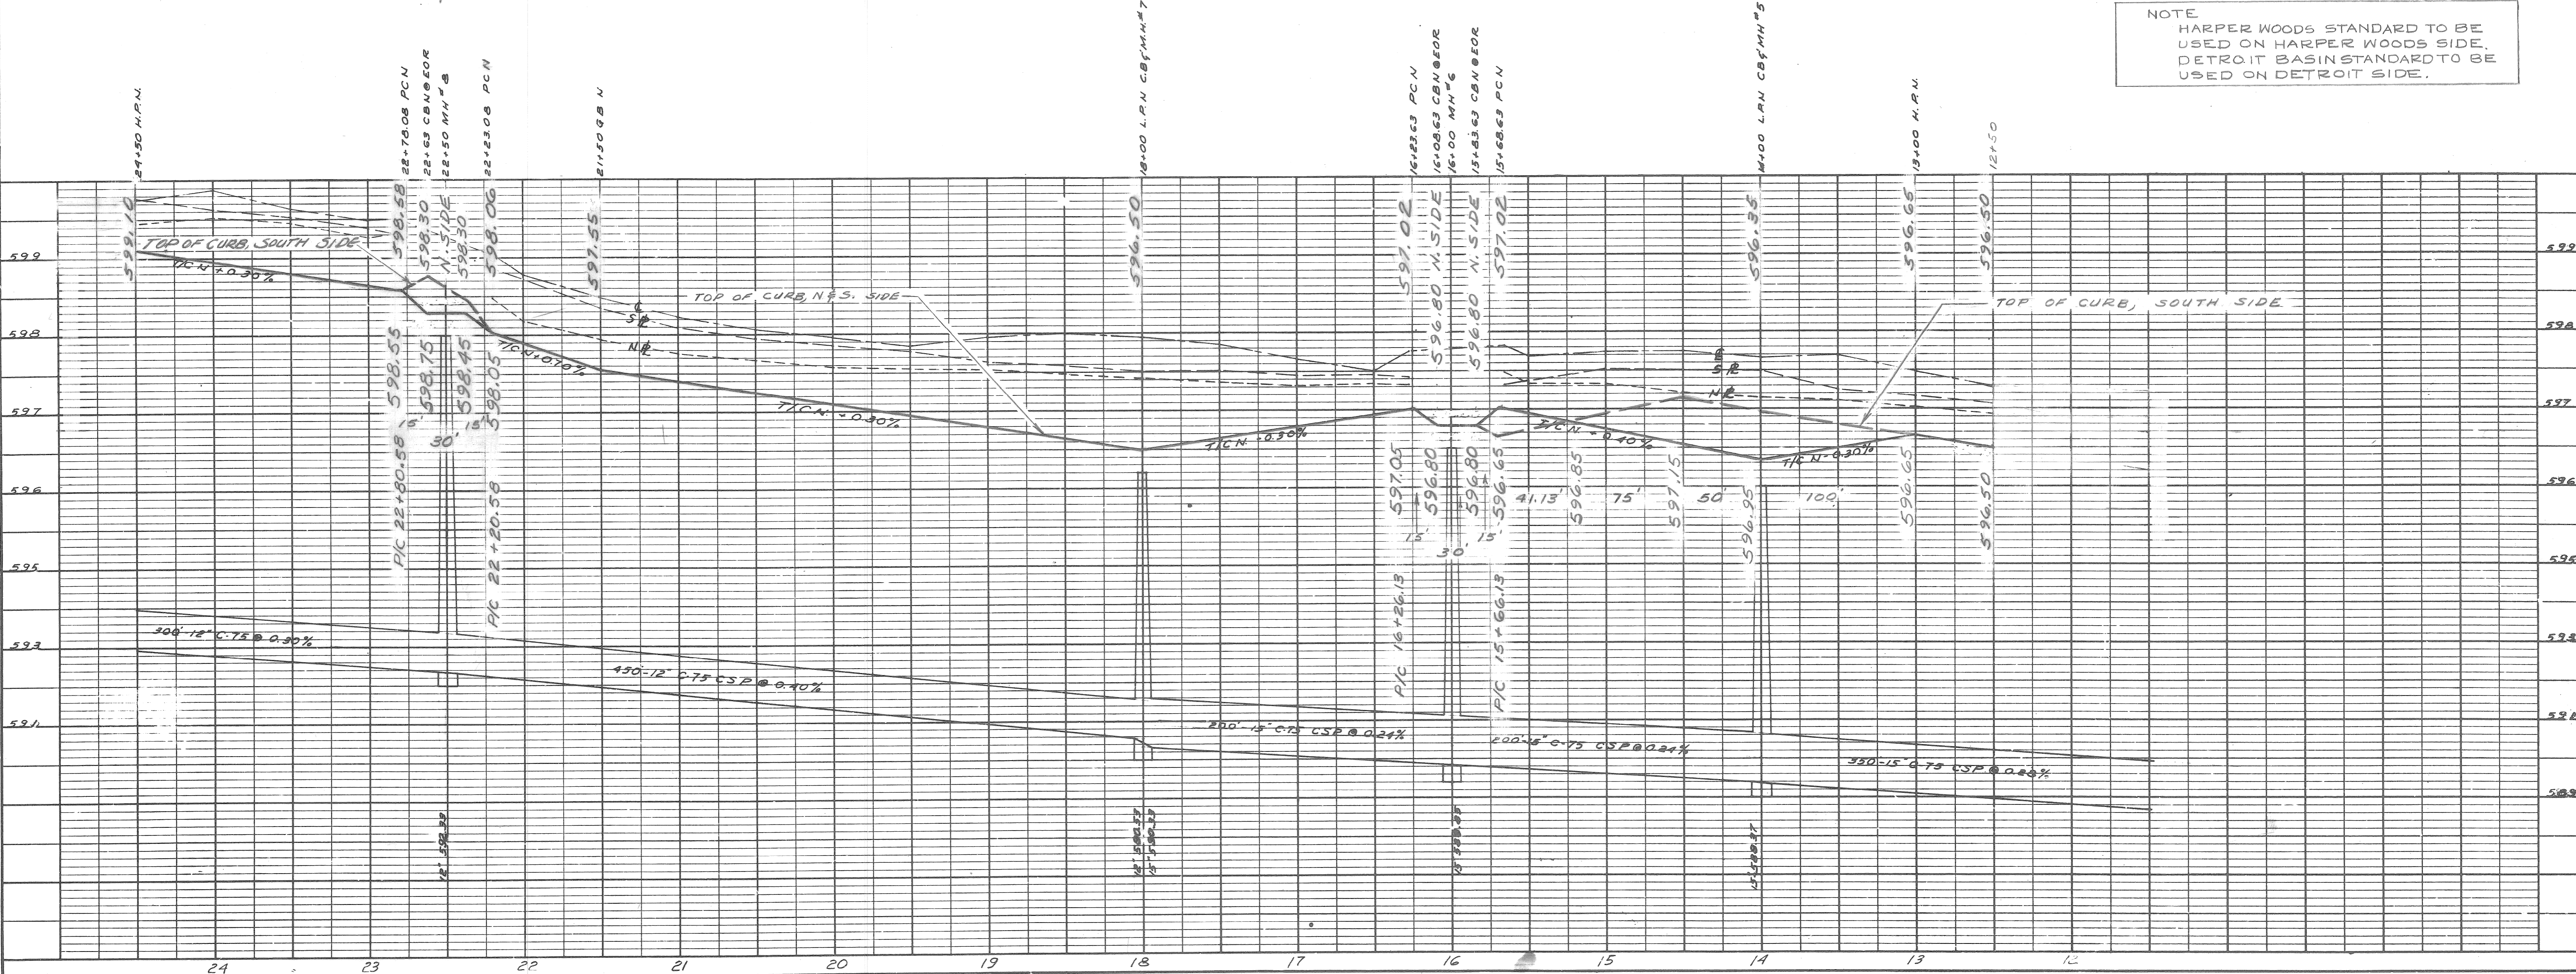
PLAN-PROFILE O. P. R. & R. E.
